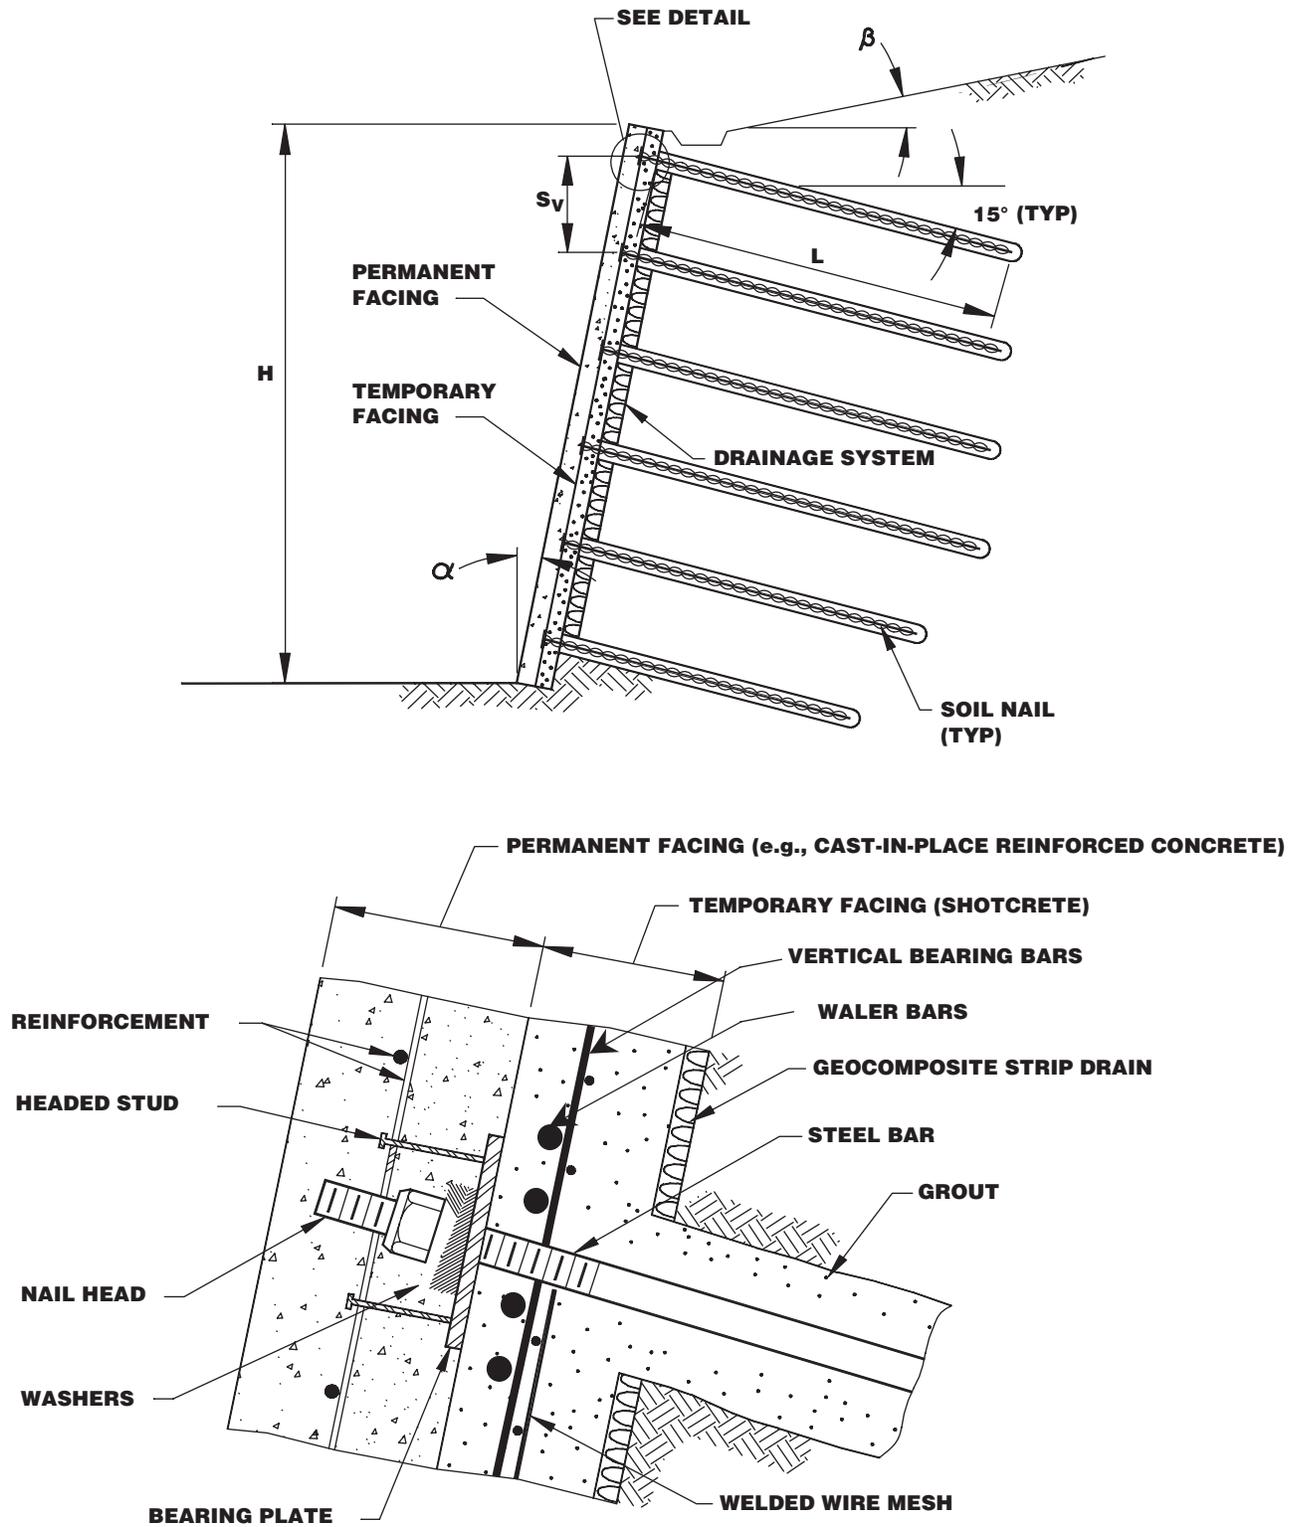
Typical cross section of a soil nail wall in common U.S. practice.
